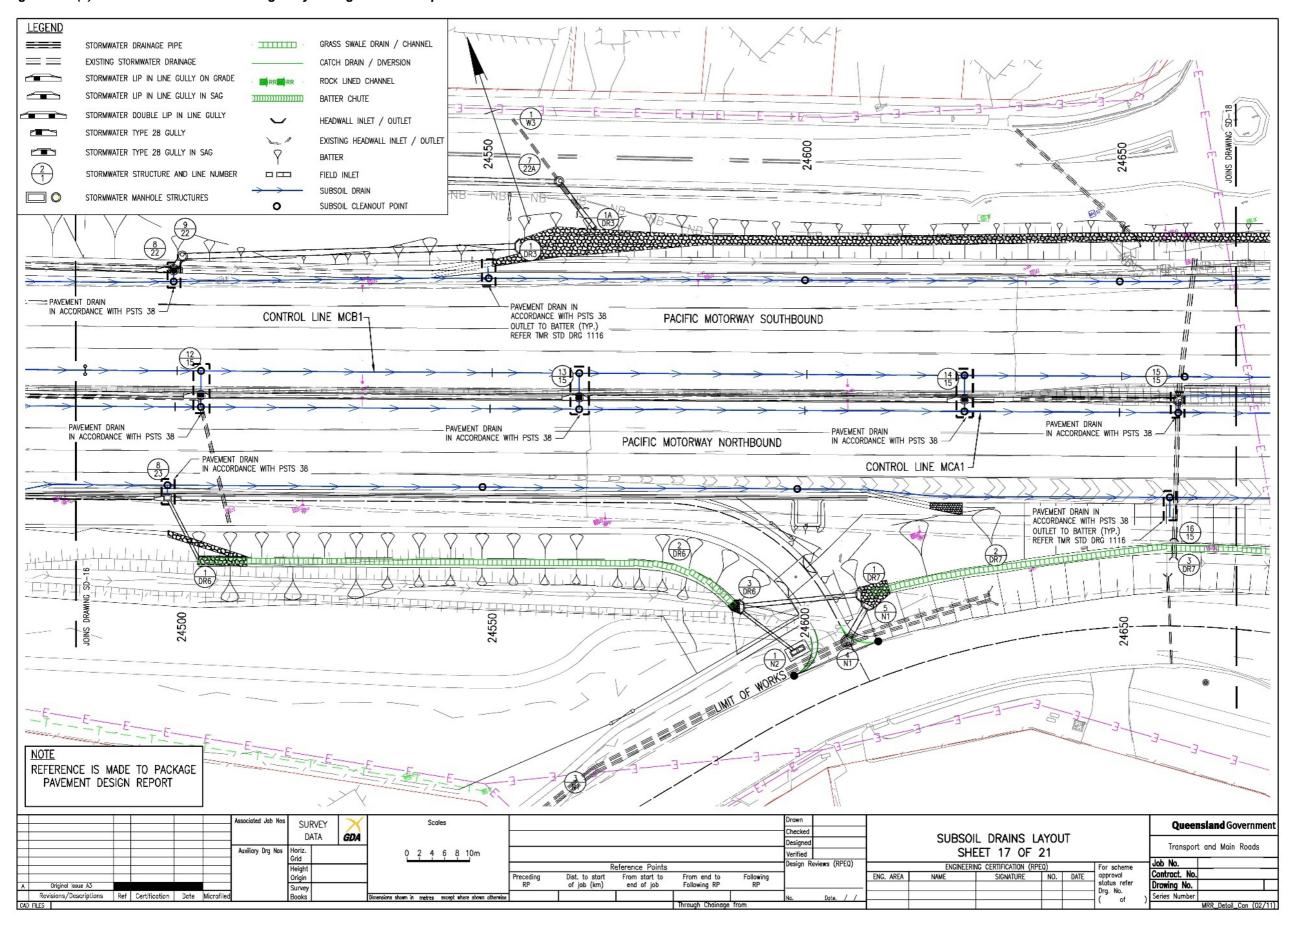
(f) – Pavement Subsoil Drains Details – generic example
